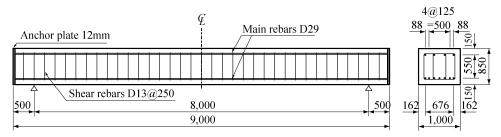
Full-scale rock-shelter type RC girder subjected to weight falling
